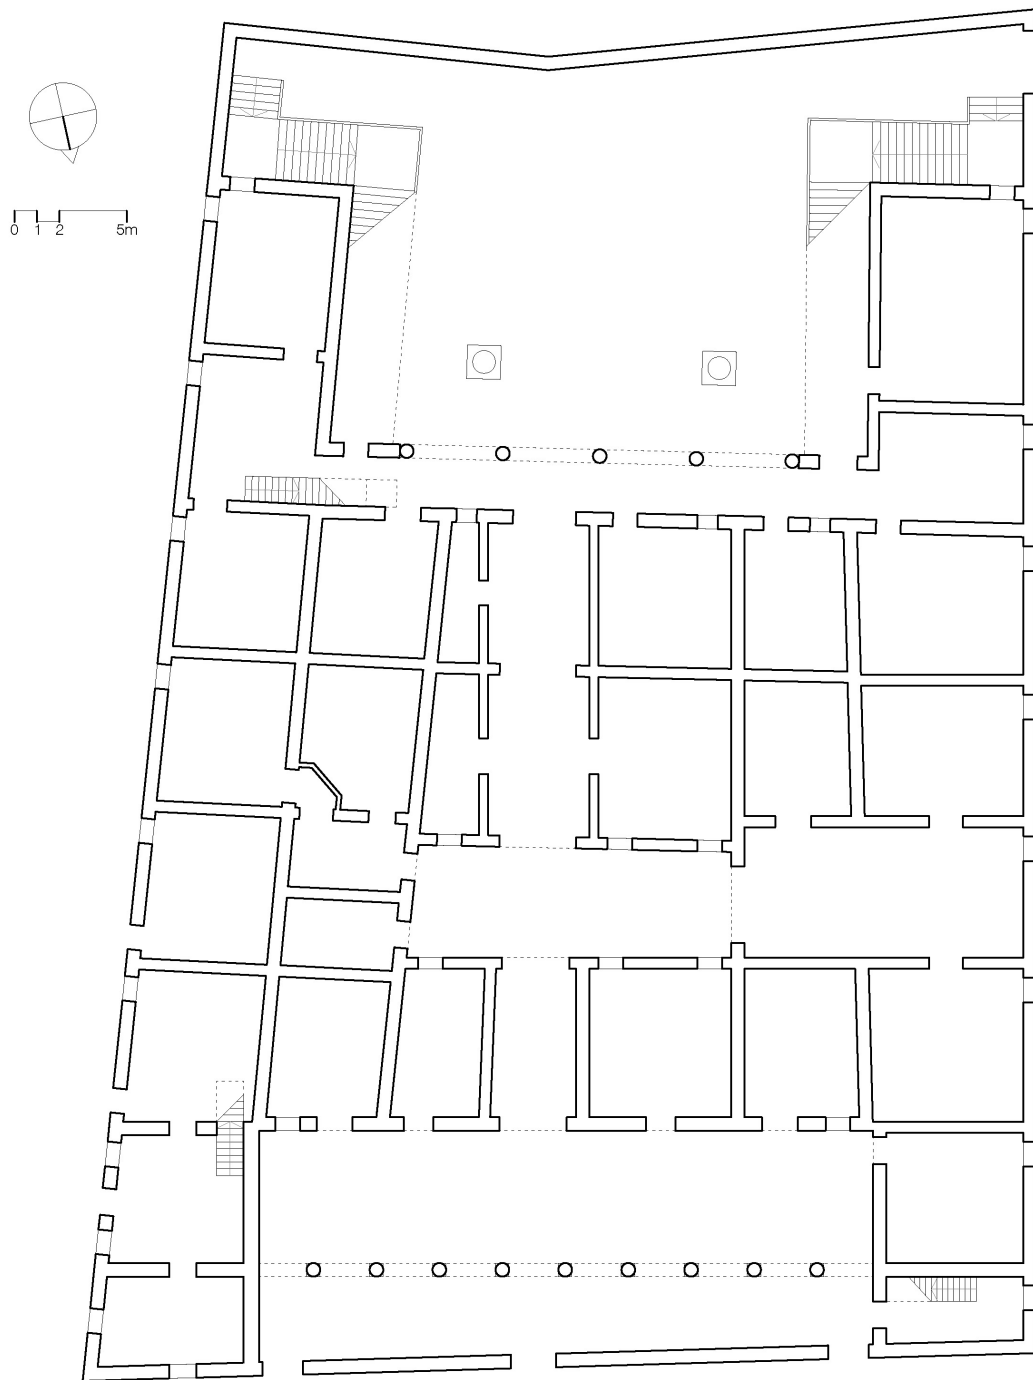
10 Petar Strunje, Ante Spahija, *Conjectural reconstruction of the Fondaco dei Turchi after 1621 – ground-floor plan.
